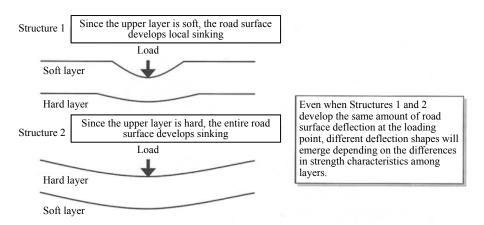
Structural evaluation of pavement based on the amount and shape of deflection⁸⁾
